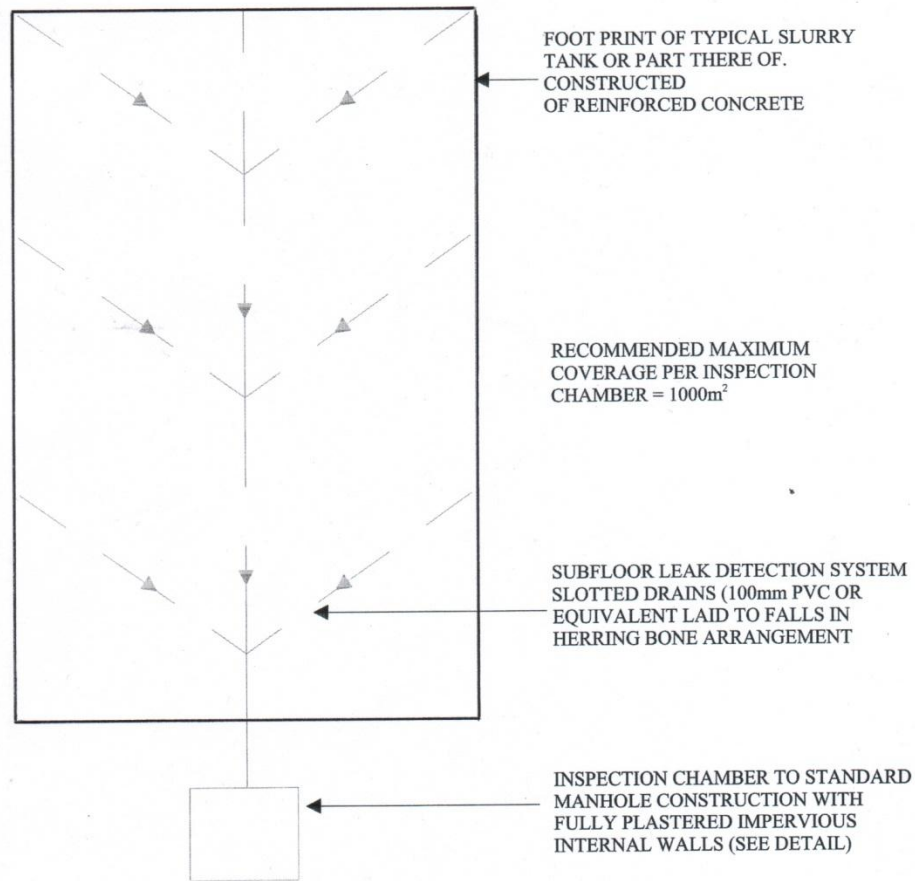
Plan view of typical leak detection system for a partially below-ground slurry tank
